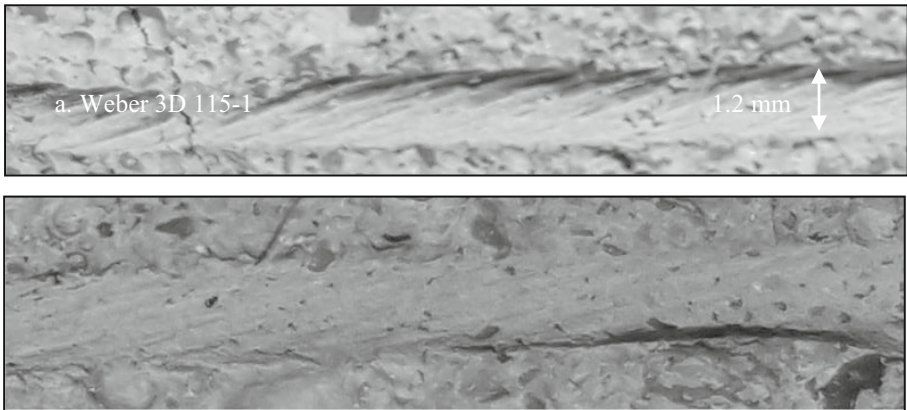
Specimens with Flex 1.2 cable, after cable removal. The top specimen, with 115-1 mortar, shows a much more clear cable imprint than the bottom specimen, with 145-1 mortar.
